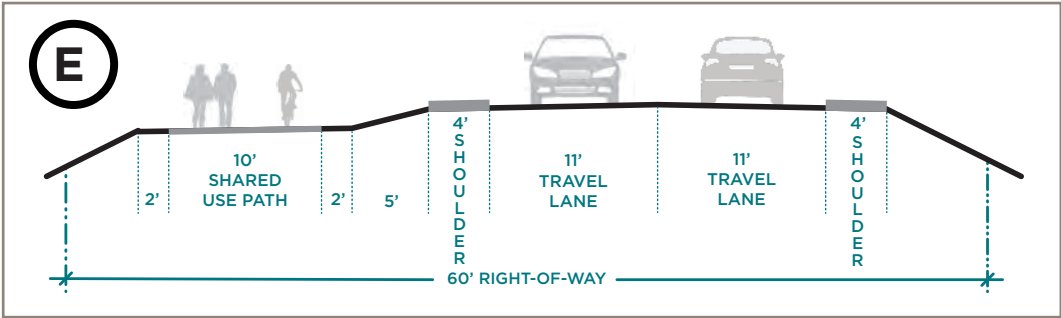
Preferred Alternative Sha-Ron/Marshall Typical Section Looking East
